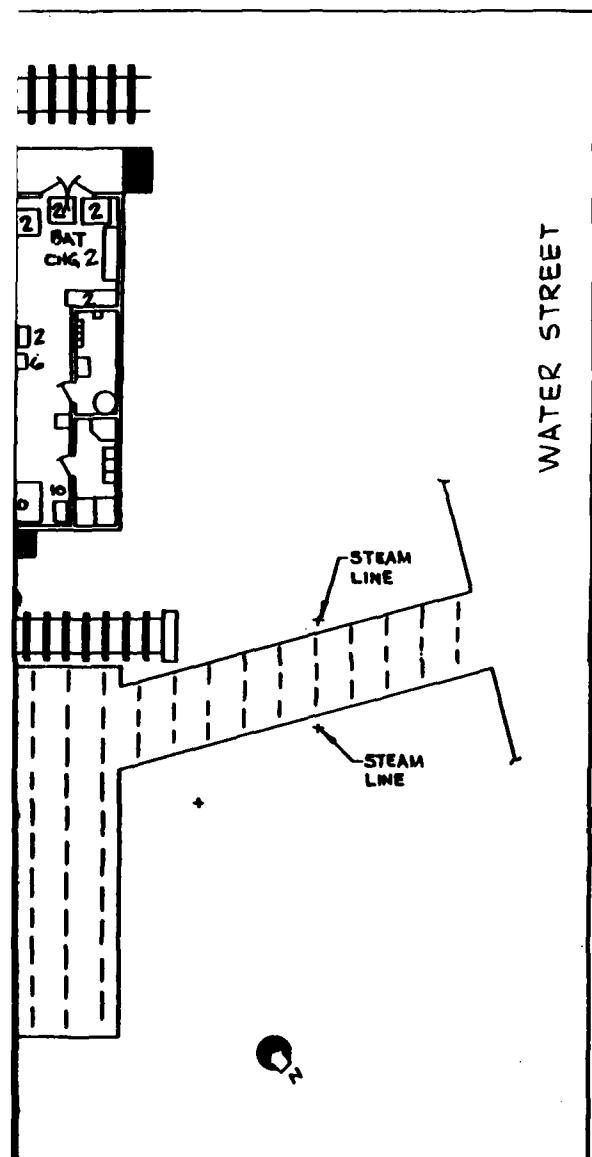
Proposed layout of building 185, first floor showing diesel/winch repair area, enlarged loading platform stand, indoor stairway and gratings on drain pits.
